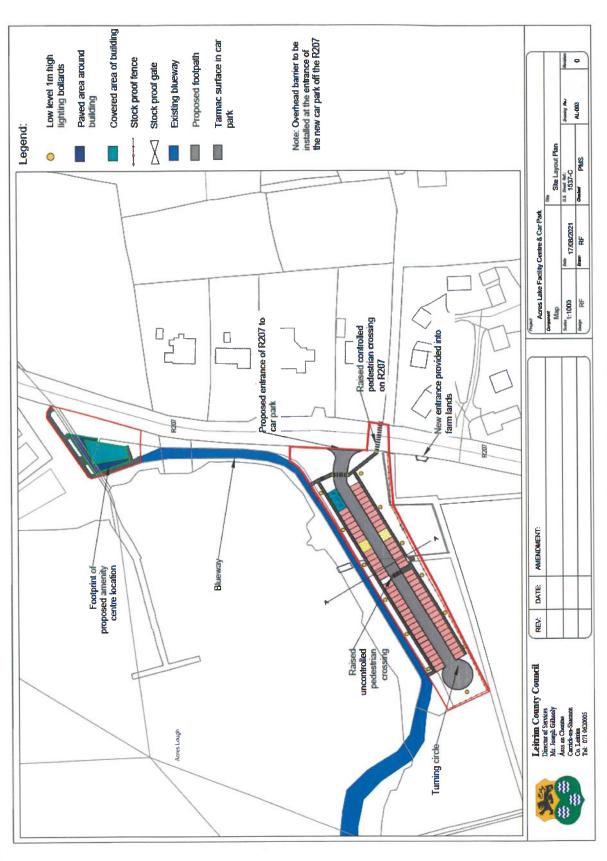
Proposed site layout and location of the facility and associated carparking area
